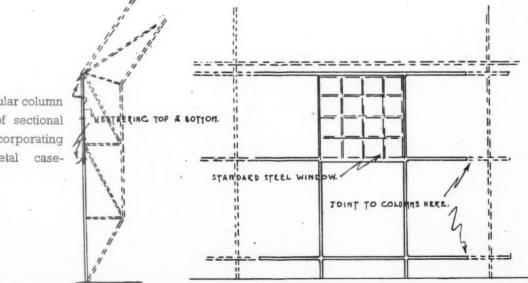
Tubular column and detail of sectional wall frame incorporating standard metal casement.
